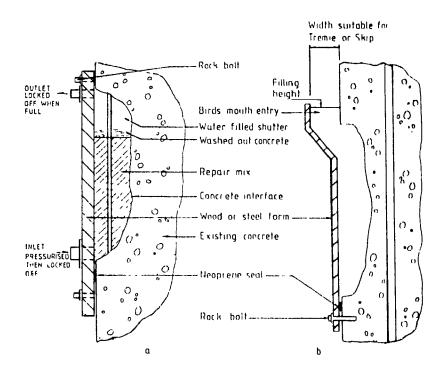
TYPICAL FORMWORK DETAIL FOR UNDERWATER REPAIR: (a) FUMPING SHUTTER; (b) BIRD'S MOUTH SHUTTER<sup>2</sup>
